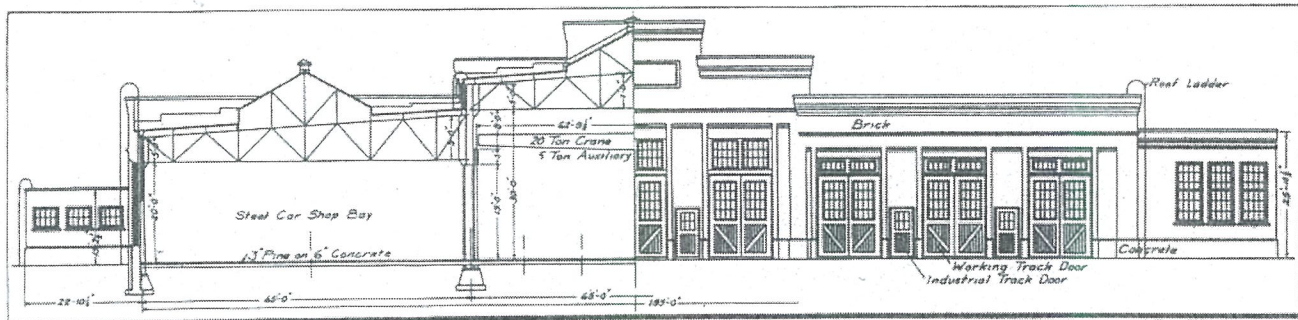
Cross Section and End Elevation of Freight Car Shop.
